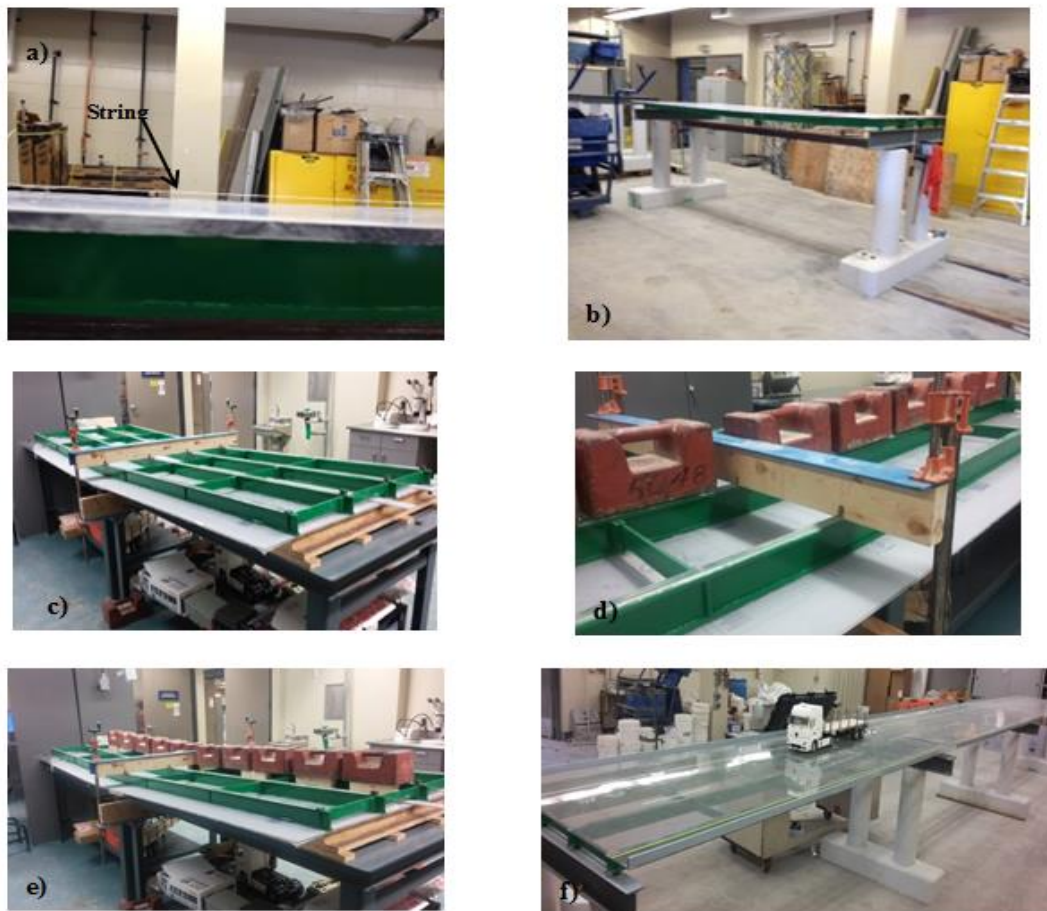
Post tensioning of girders: (a) deflection at mid-span compared with string line; (b) deflected simply supported span; (c) bridge held down over formwork; (d) distributed load left on girder for bonding with strips; (e) distributed load left on girder for bonding with strips; (f) deflections removed after post-tensioning
